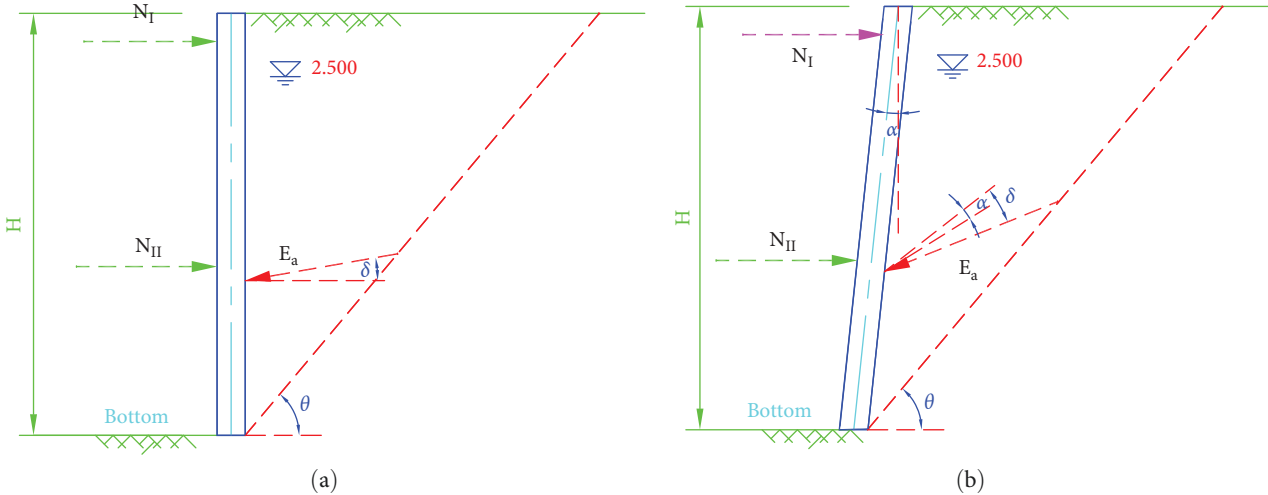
Force analysis of steel sheet pile support: (a) vertical sheet piles; (b) oblique sheet piles.
